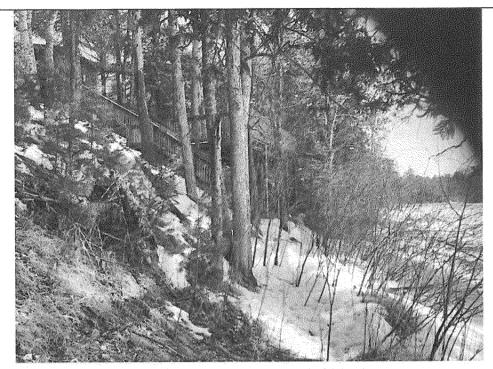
Photo looking south at the Michigan shoreline near the north third of the proposed cut-off wall location (Aquila, 2018).
